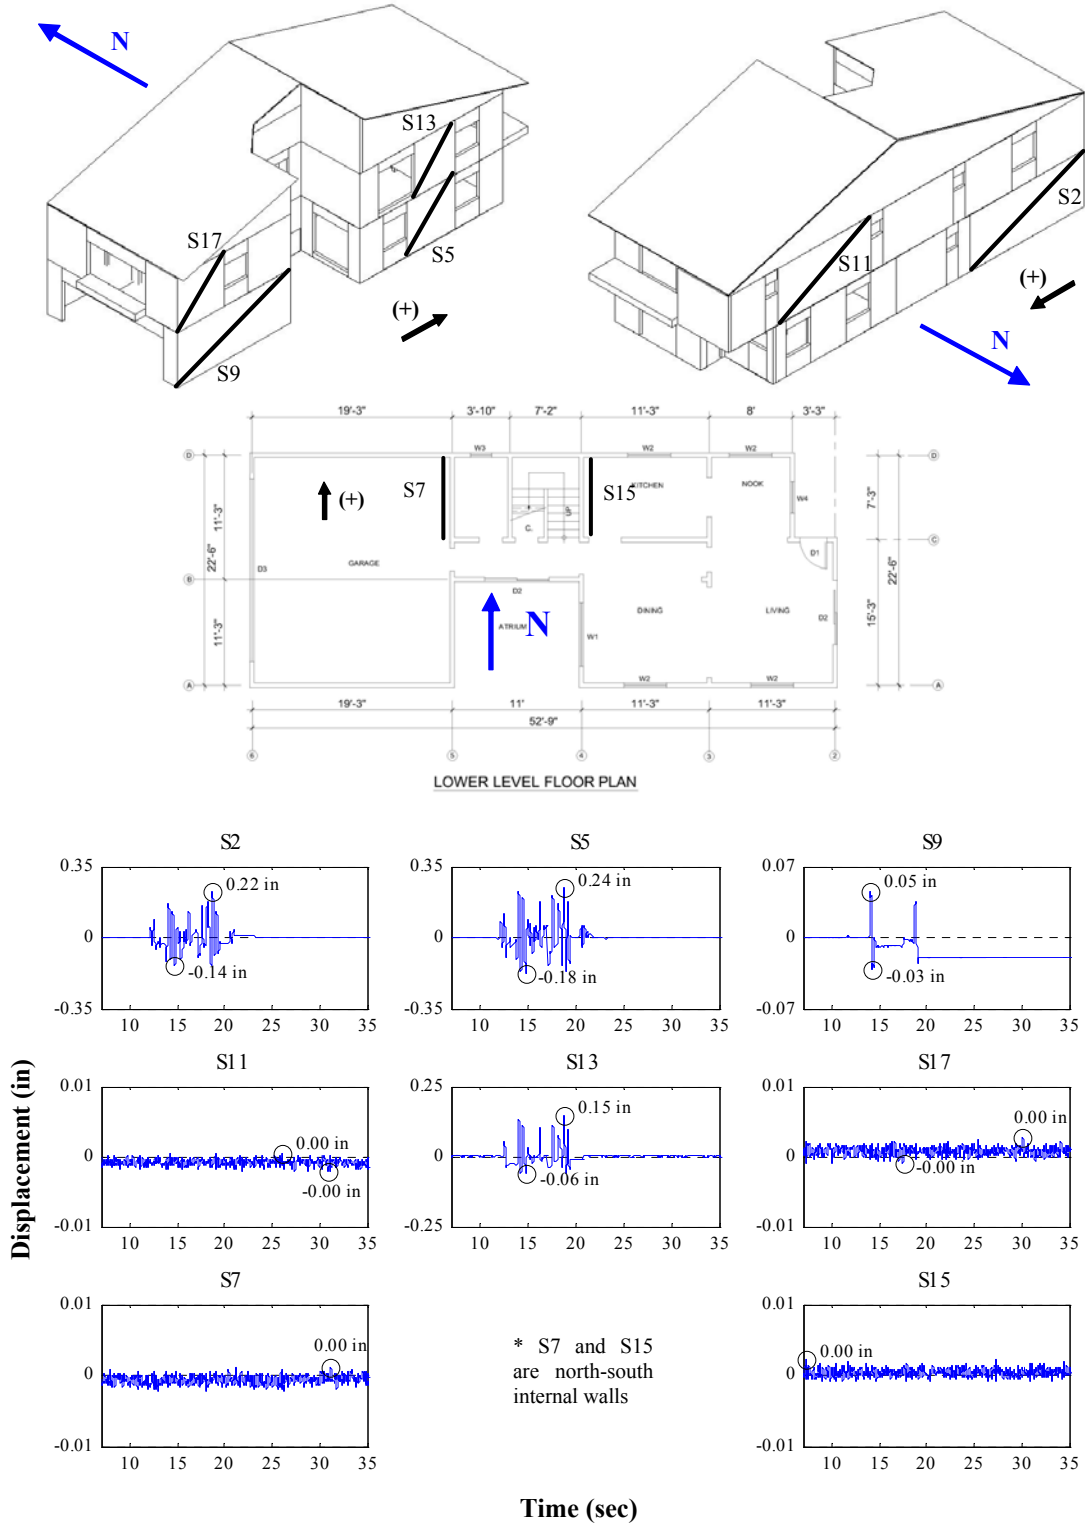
Wall deformations of east-west internal walls for Test NWP2S12
